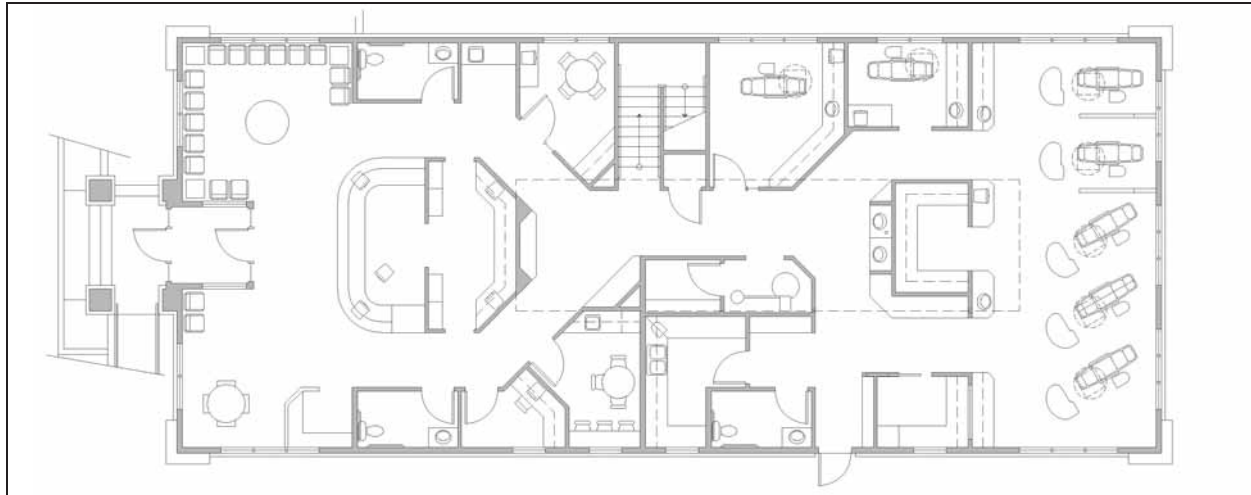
Dr. Booth's floor plan, showing work spaces and traffic-flow patterns.
